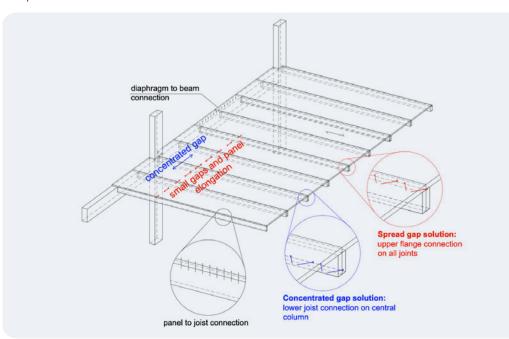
Sample design for a concentrated floor gap (blue) and spread gaps and panel elongation (red). Solutions for a timber-only engineered floor.
